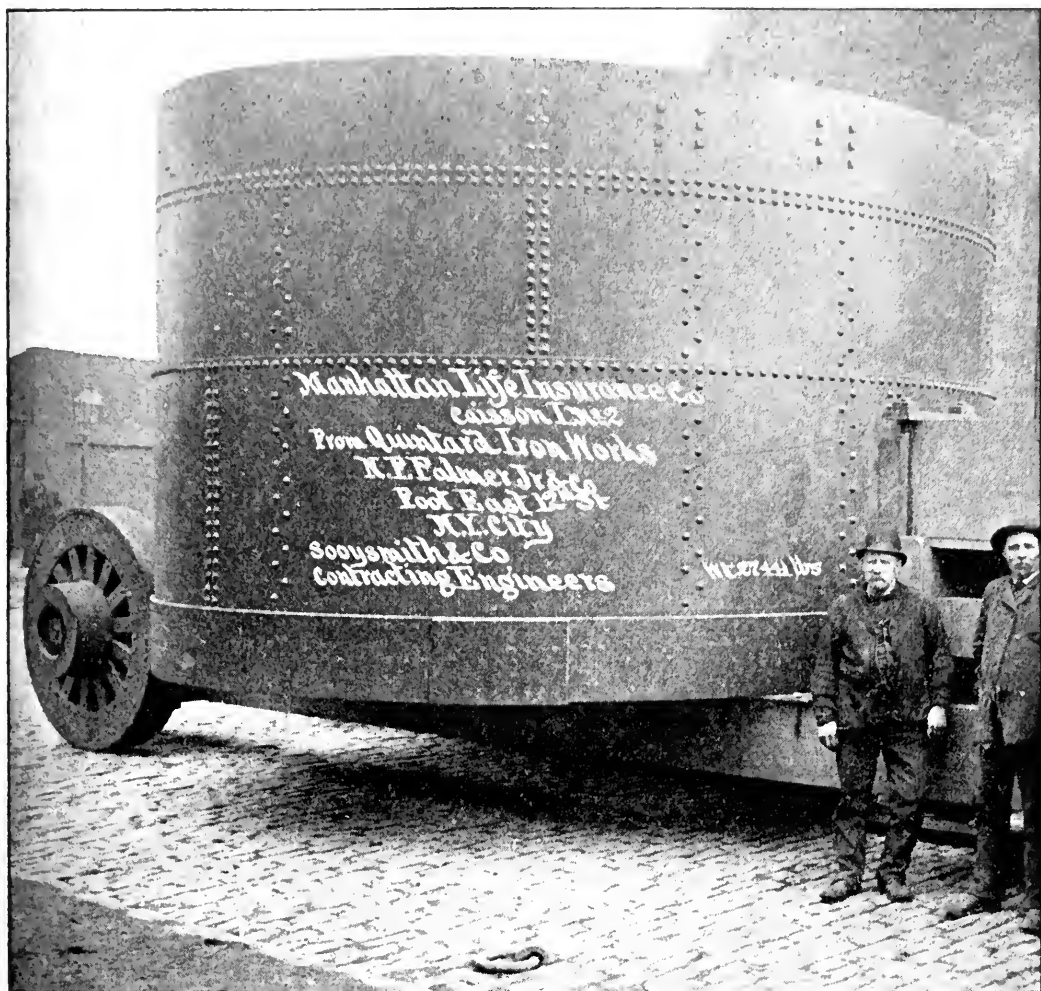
ONE OF THE SMALL CAISSONS, MANHATTAN LIFE BUILDING,
